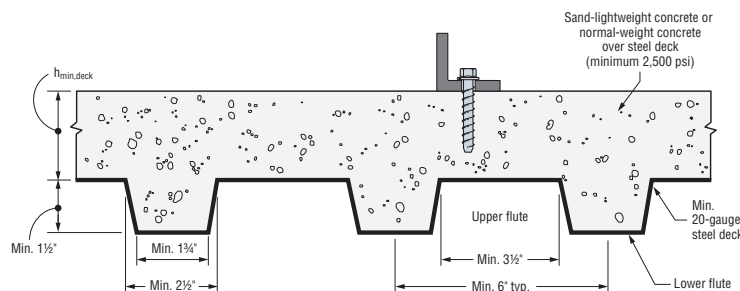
Installation of 1/4"- and 3/8"-Diameter Anchors in the Topside of Concrete over Steel Deck
